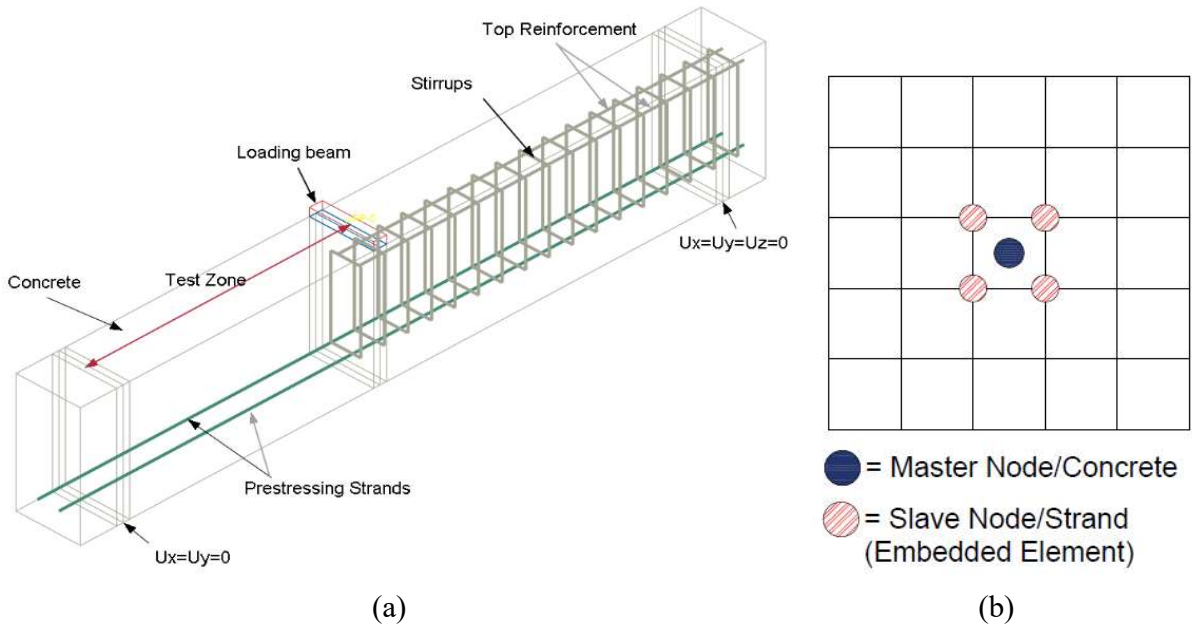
FE Modelling (a) Schematic view of prestressed concrete beam elements, (b) Strand slave nodes and concrete master nodes
